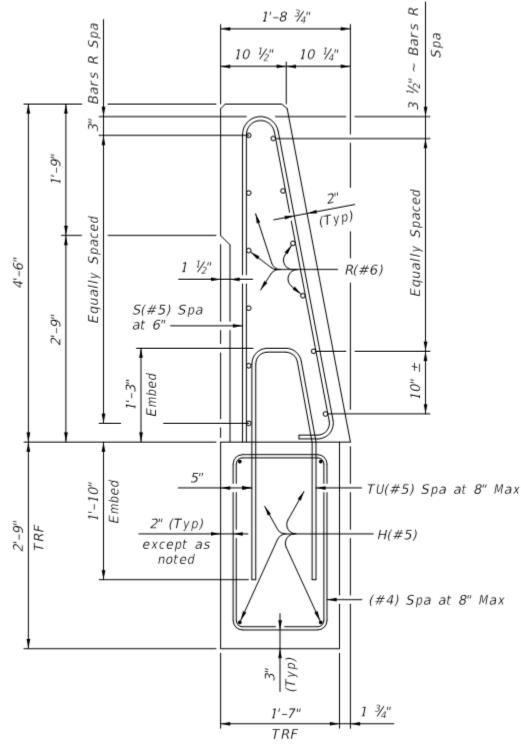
Reinforcement Details of Single Slope Barrier with TRF Concrete Beam Foundation.
